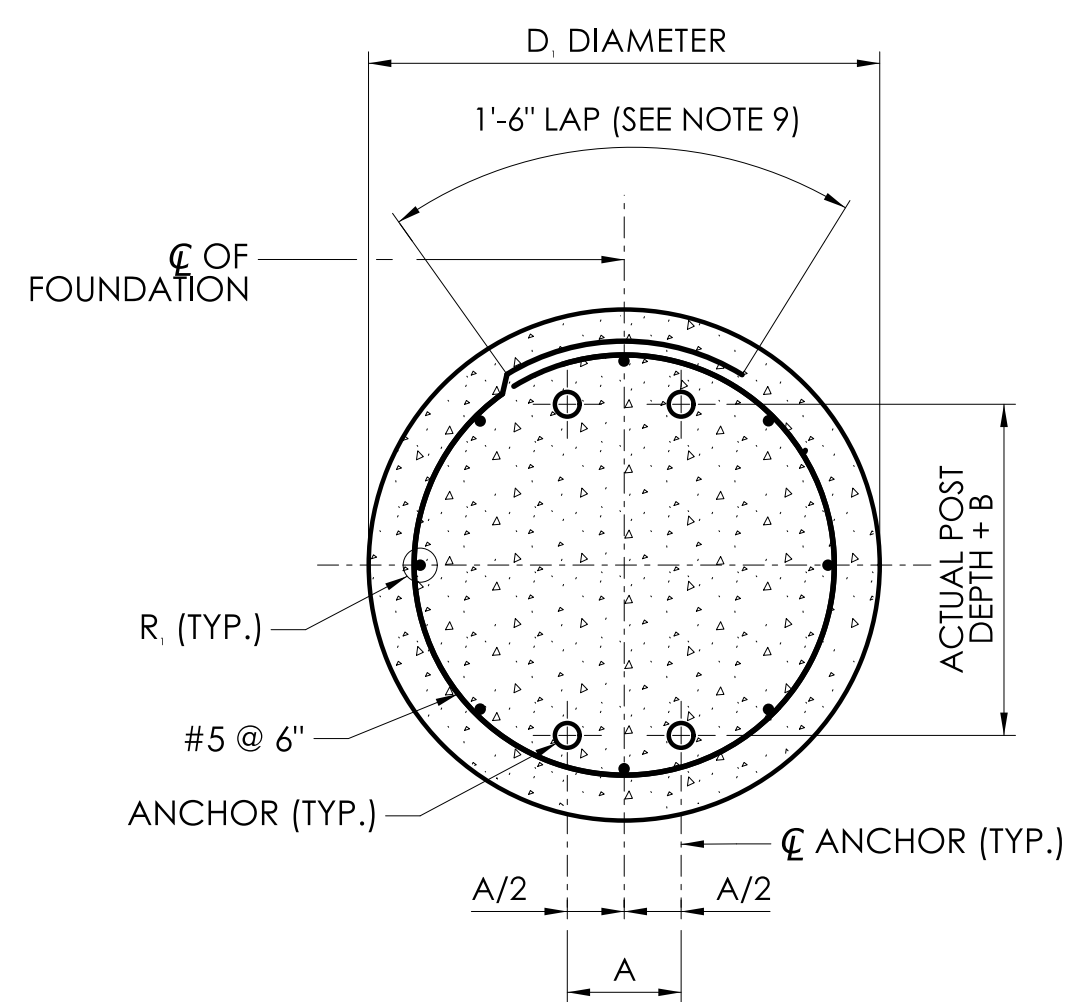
DETAIL A - PROJECTION OF FOUNDATION ABOVE GROUND
